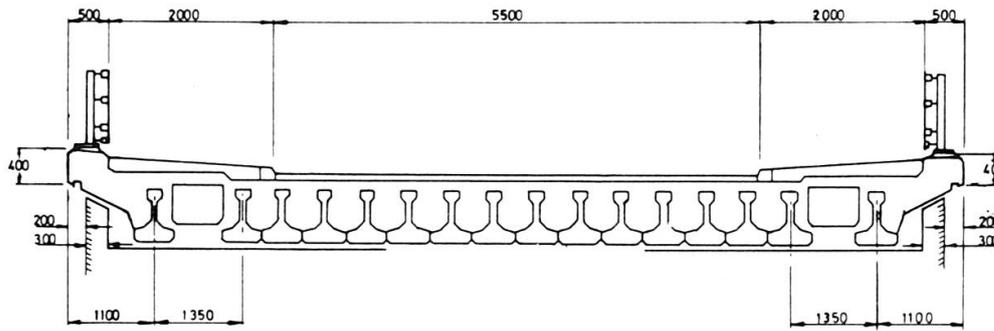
Pre-Stressed Concrete Inverted T-beam with in-situ concrete in-fill
